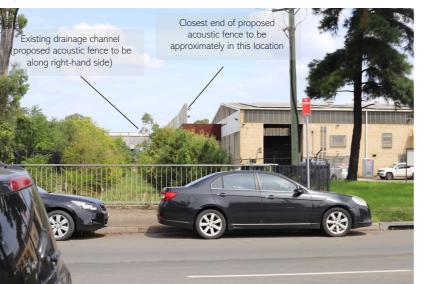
View east along Tattersall Road (opposite proposed acoustic fence site)
